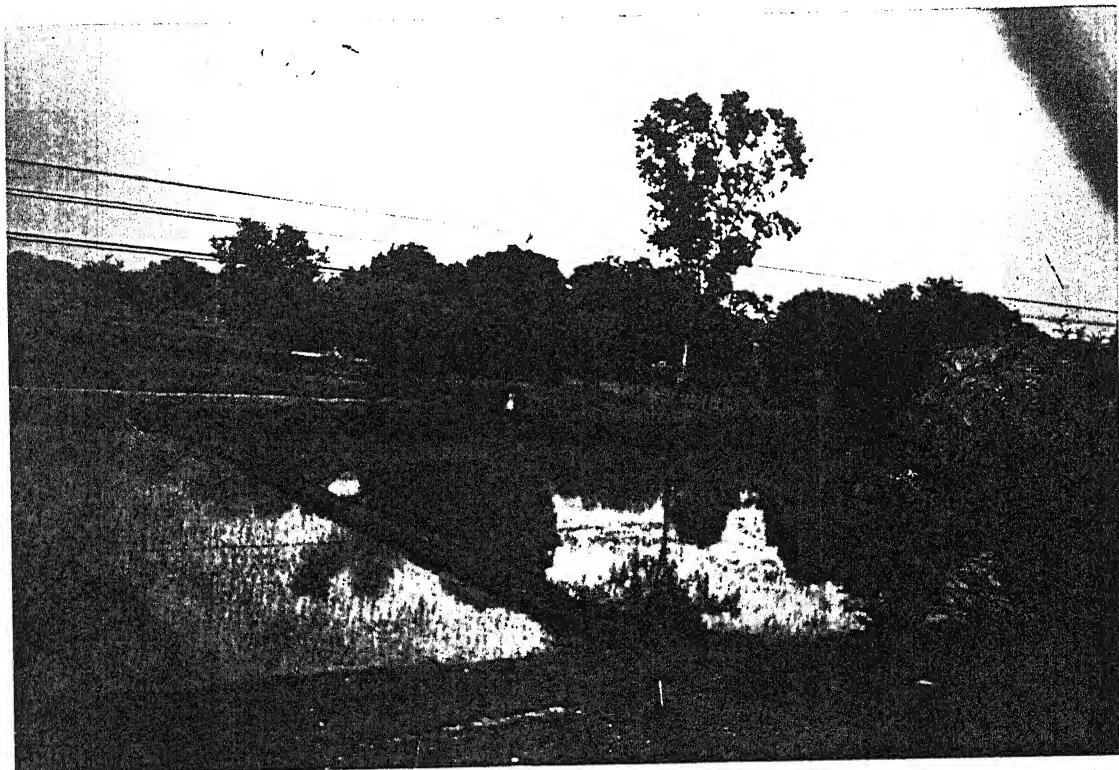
Check Dam (CD) of Marrow village of Shankargarh block, constructed from work Fund
